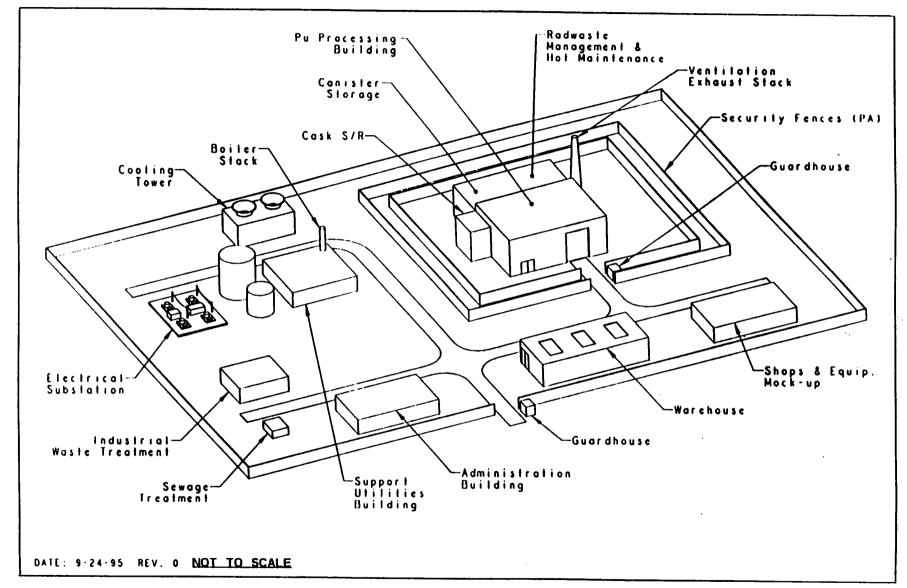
Perspective View of the Disassembly & Conversion Facility
